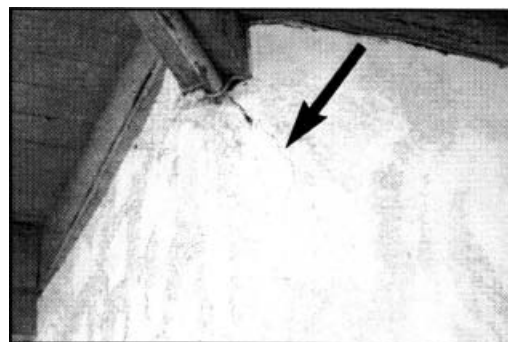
Minor crack in the exterior stucco at the northeast corner of the building below the balcony. The crack extends to just above the balcony.
